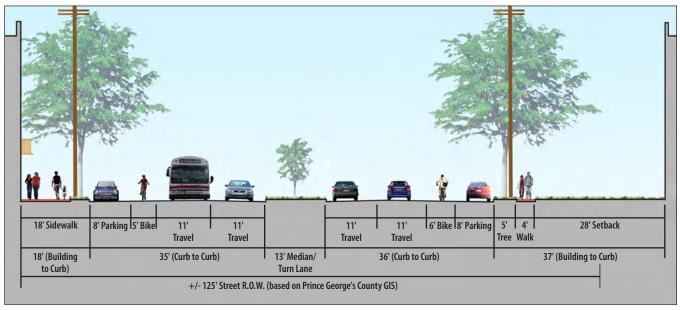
PROPOSED SHORT-TERM STREET SECTION—RHODE ISLAND AVENUE, WEST OF TRAFFIC CIRCLE, LOOKING WEST.
